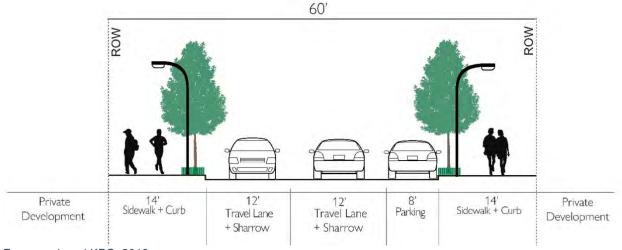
Lakewood Towne Center Boulevard between Bridgeport Way SW and Gravelly Lake Dr. SW
